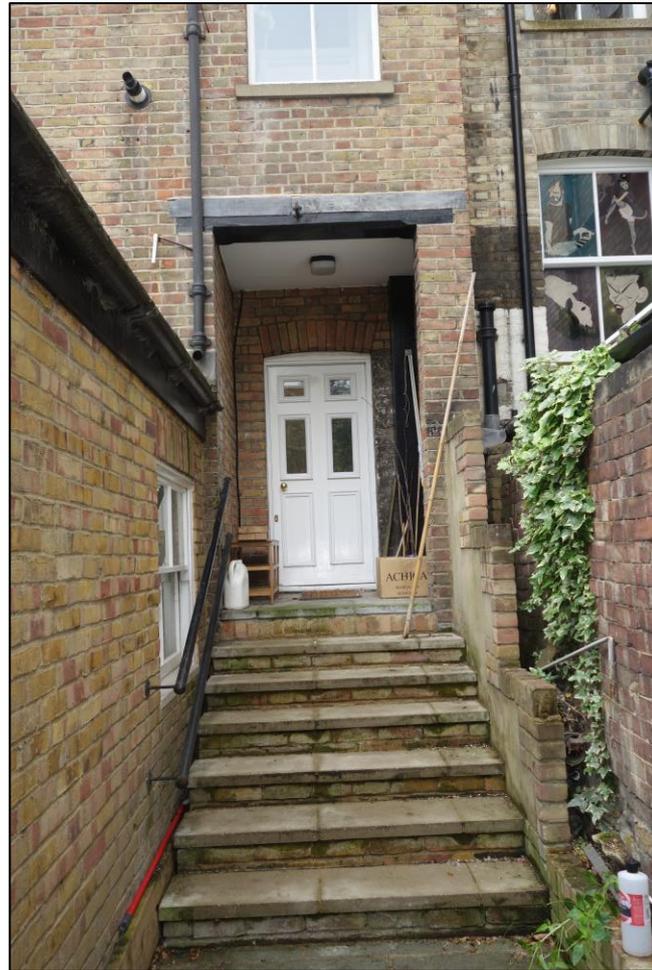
Detailed view of two storey rear extension with steps leading to segmental arched door opening, with single storey extension to left of picture
